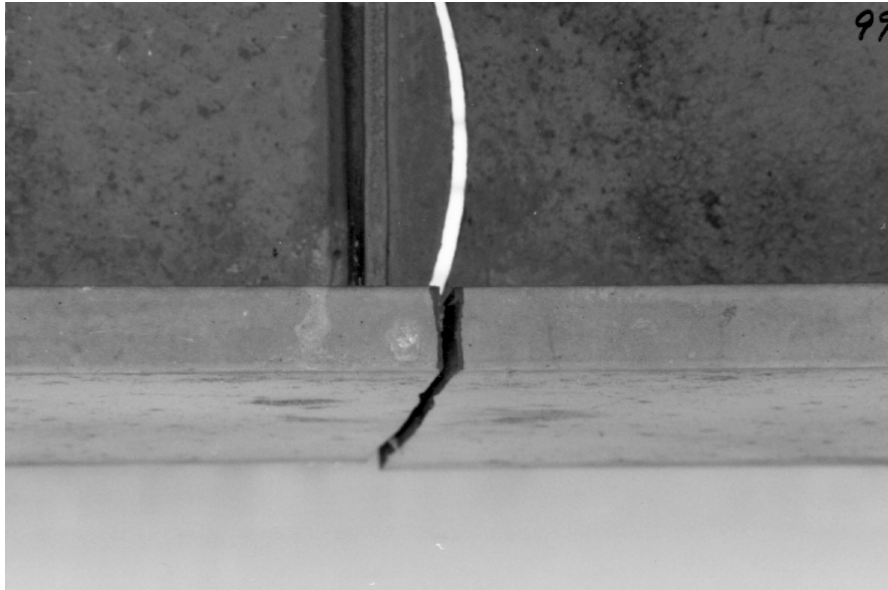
View of fracture through the bottom flange of the girder
